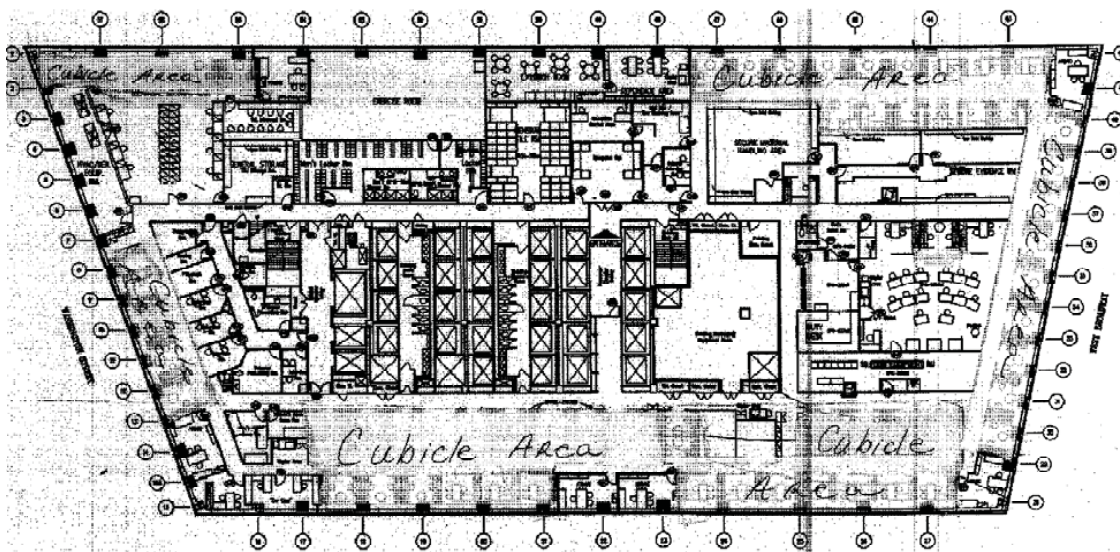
Approximate floor plan of the 9th floor of WTC7.
